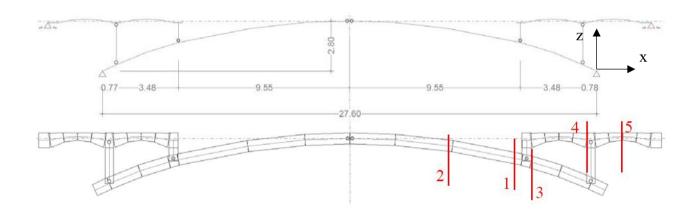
2-D bar model of the Guillermaux bridge and critical sections for verification [unit m]
